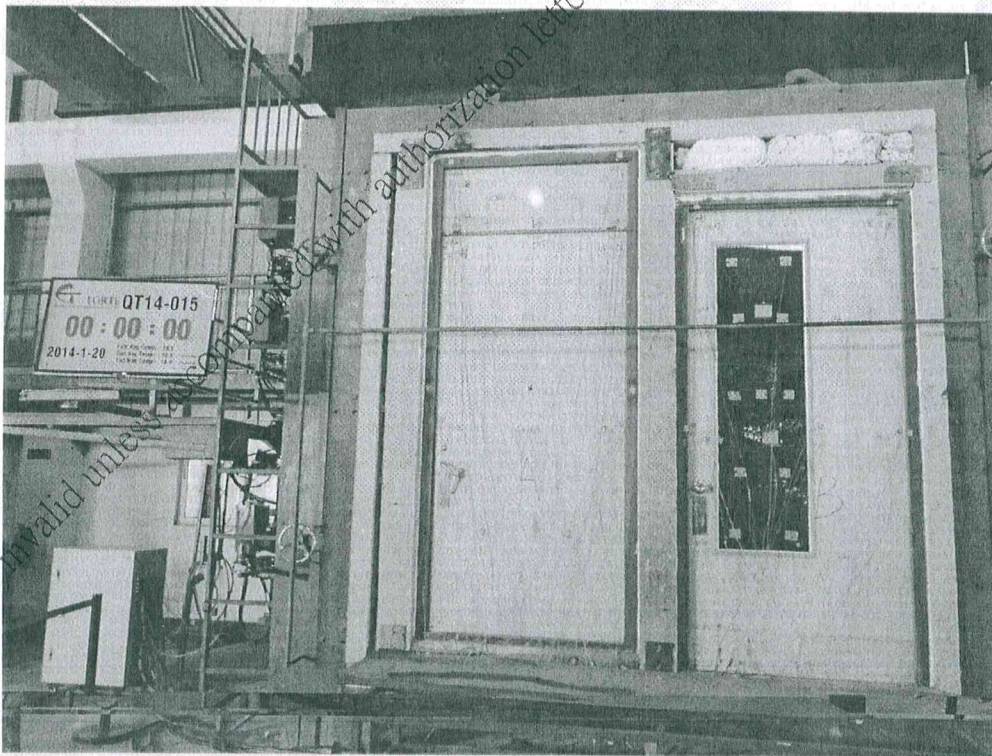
Unexposed surface of the specimens just after the commencement of test. (Left: Door A; Right: Door B)
